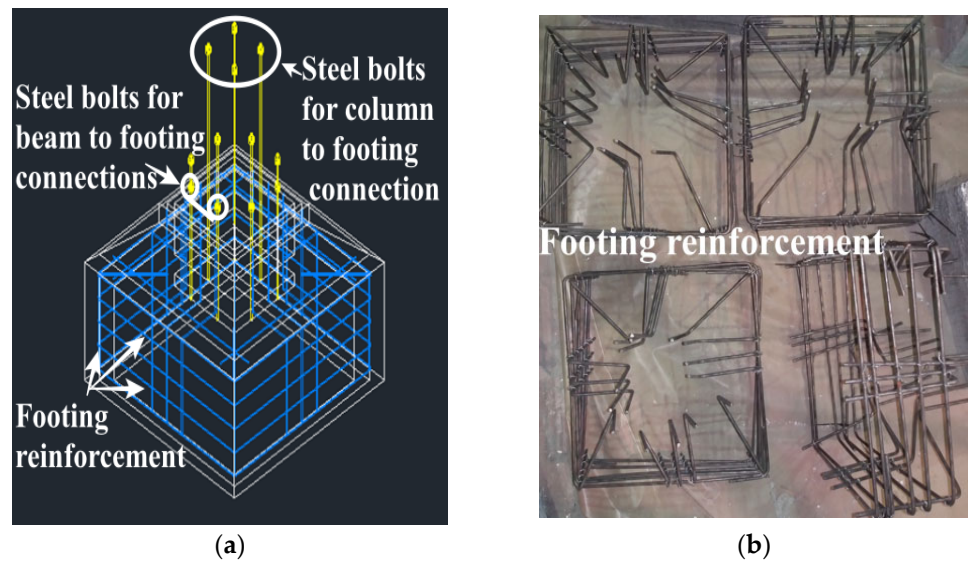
Footing reinforcement details: (a) AutoCAD details; (b) actual footing details.
